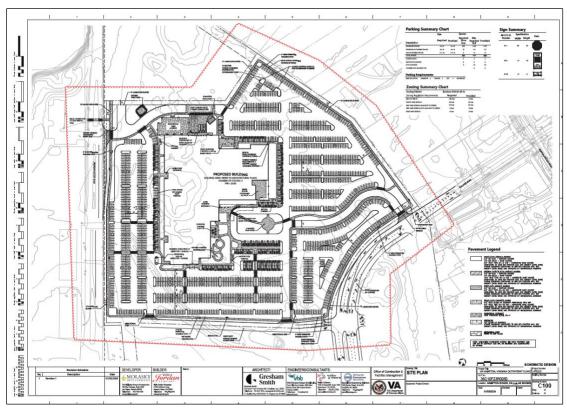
Offer 1 – Proposed conceptual site plan for the project parcel.
